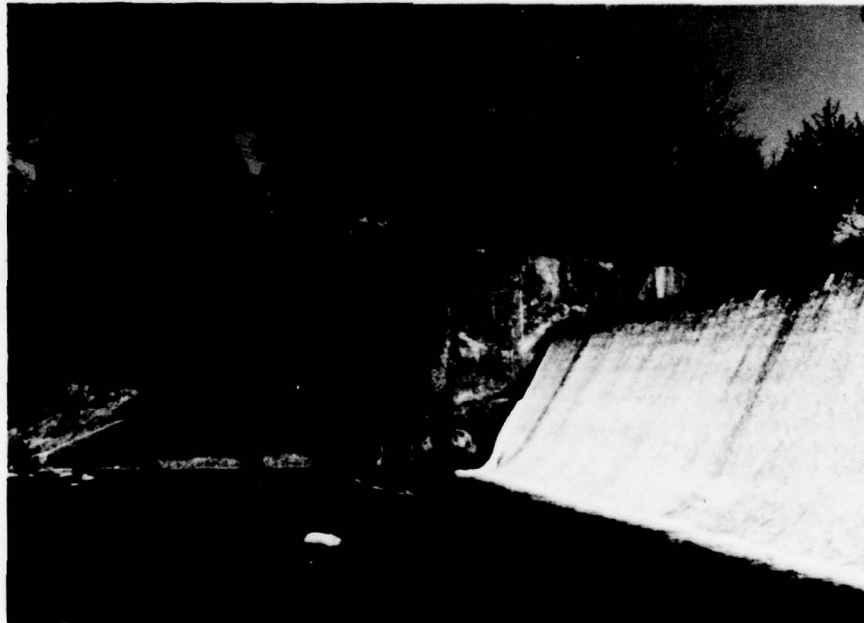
View of right wingwall. Note the seepage from the drains and the minor erosion of concrete at the water-line.
